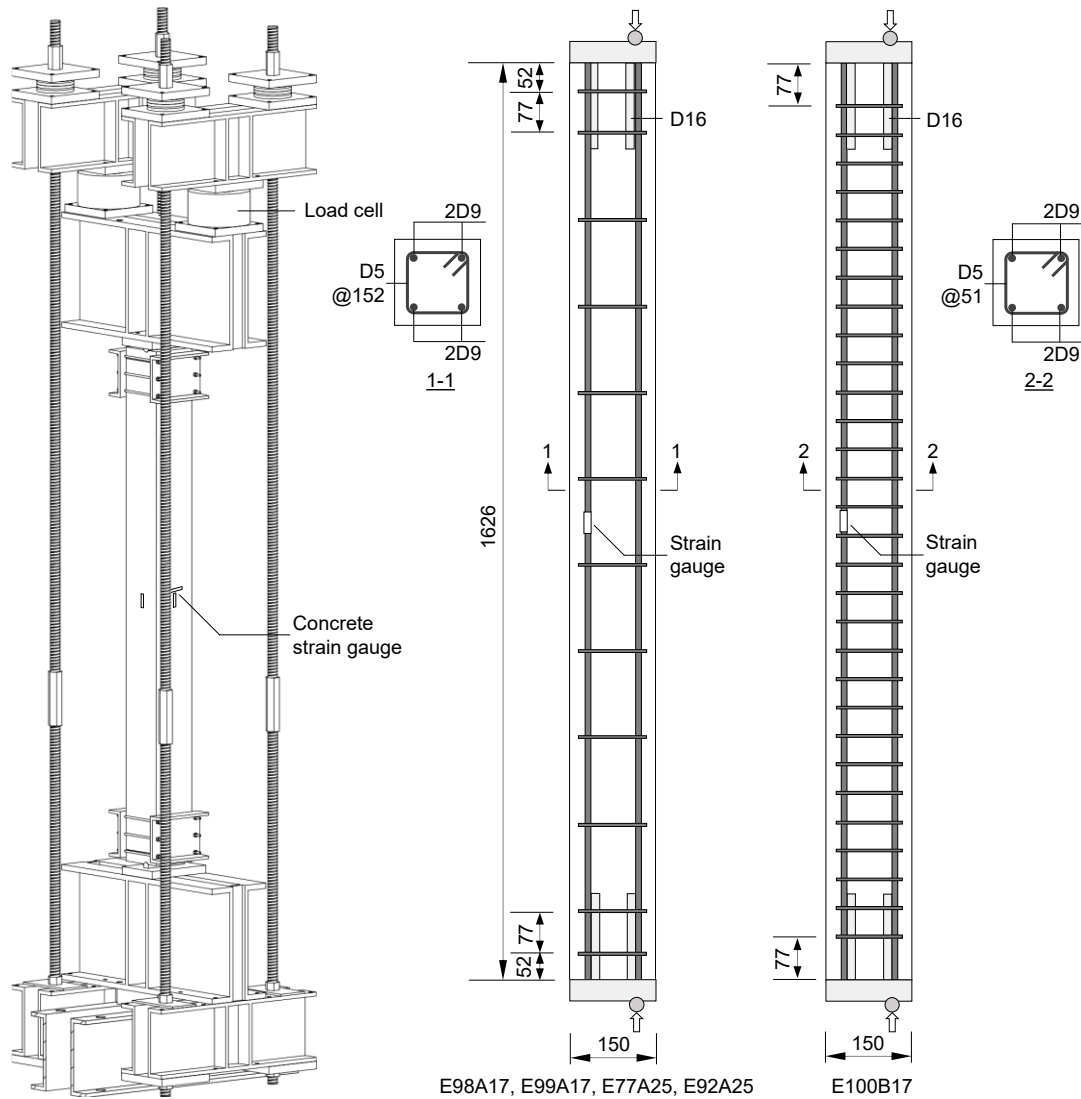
Test setup and reinforcing details for eccentrically loading columns (dimension in mm).
